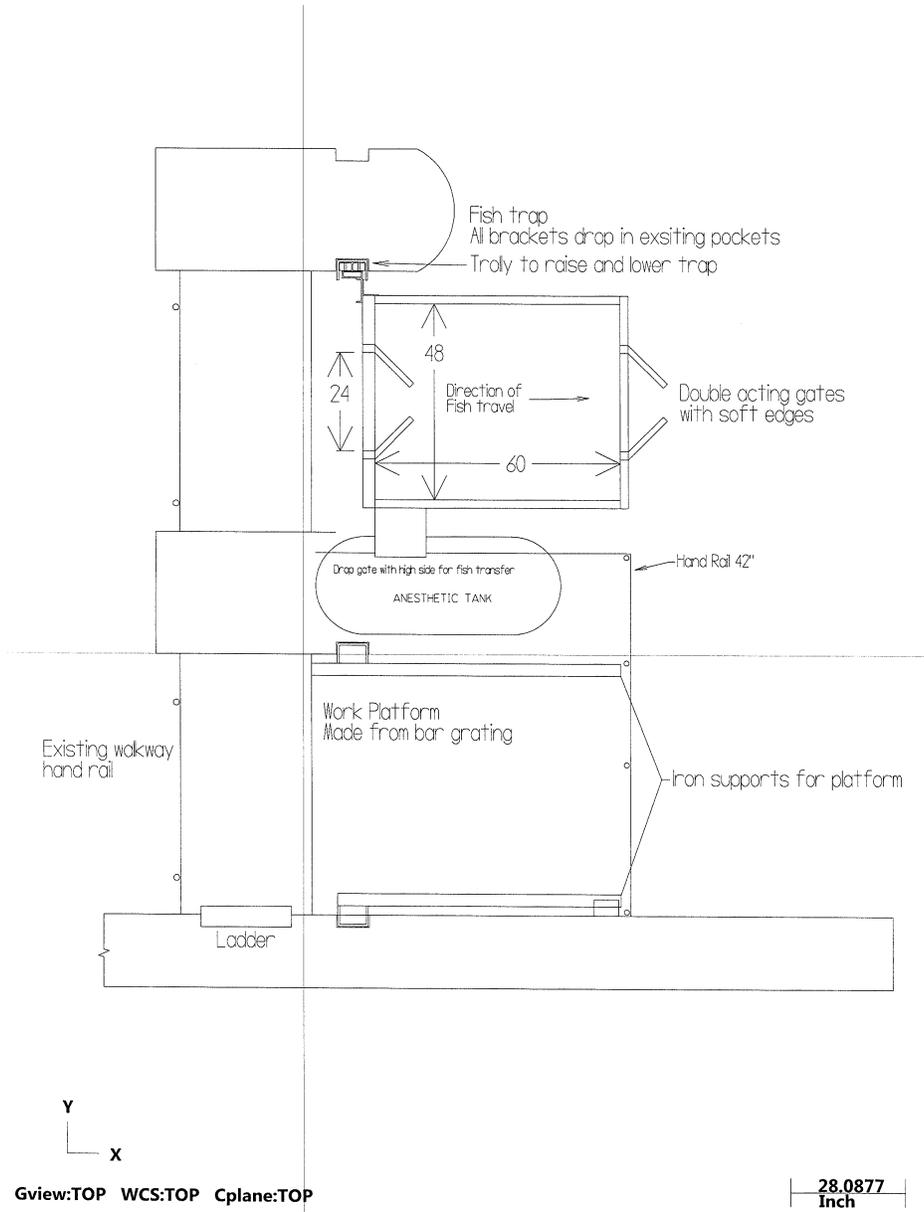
Plan view schematic of the new Lebanon Dam adult fish trap. Measurements in inches.
